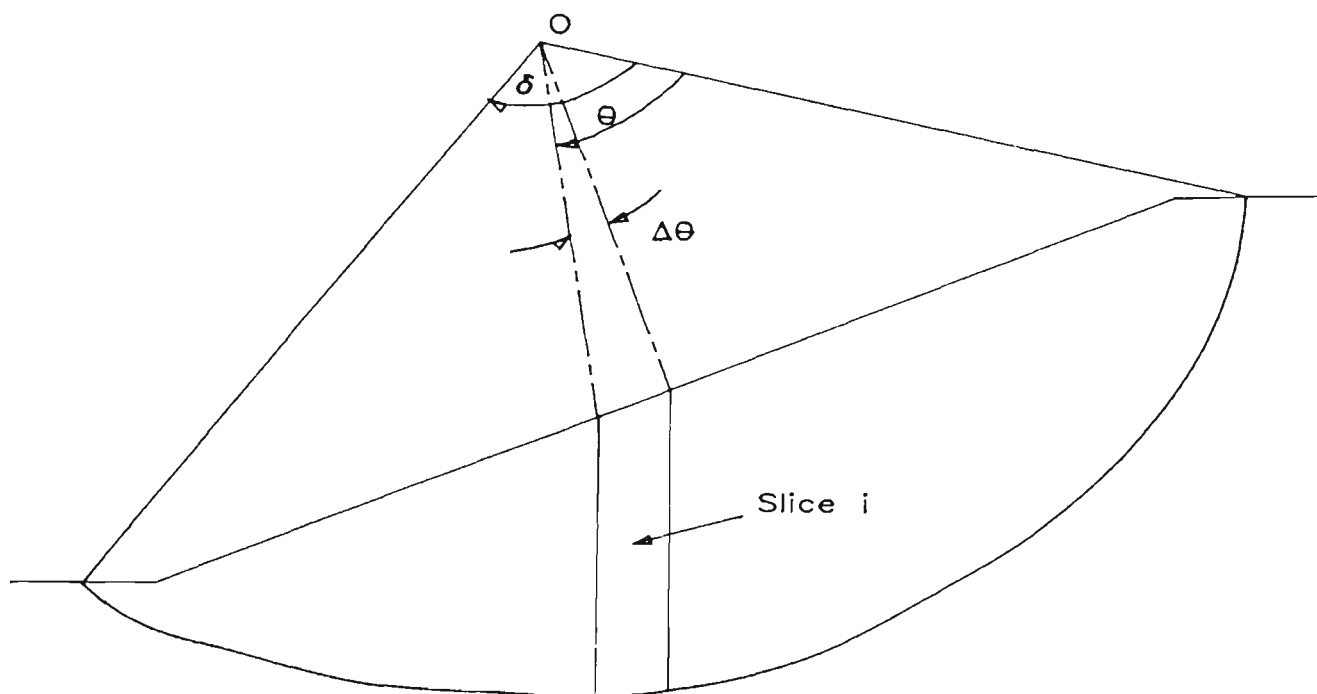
Slope Cross Section with Angles Used in BISHDIST
